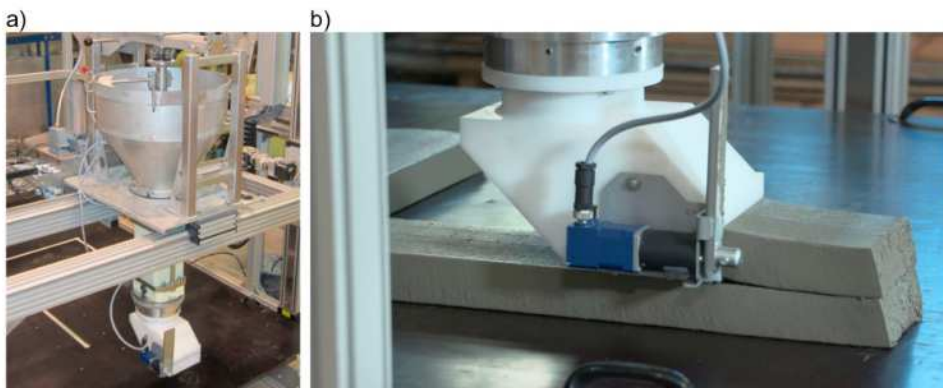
FDM technology for 3D printing with extrusion of filaments (TU Dresden): a) the printhead of CONPrint3D printer, b) view of the nozzle with extruded filaments [6]
